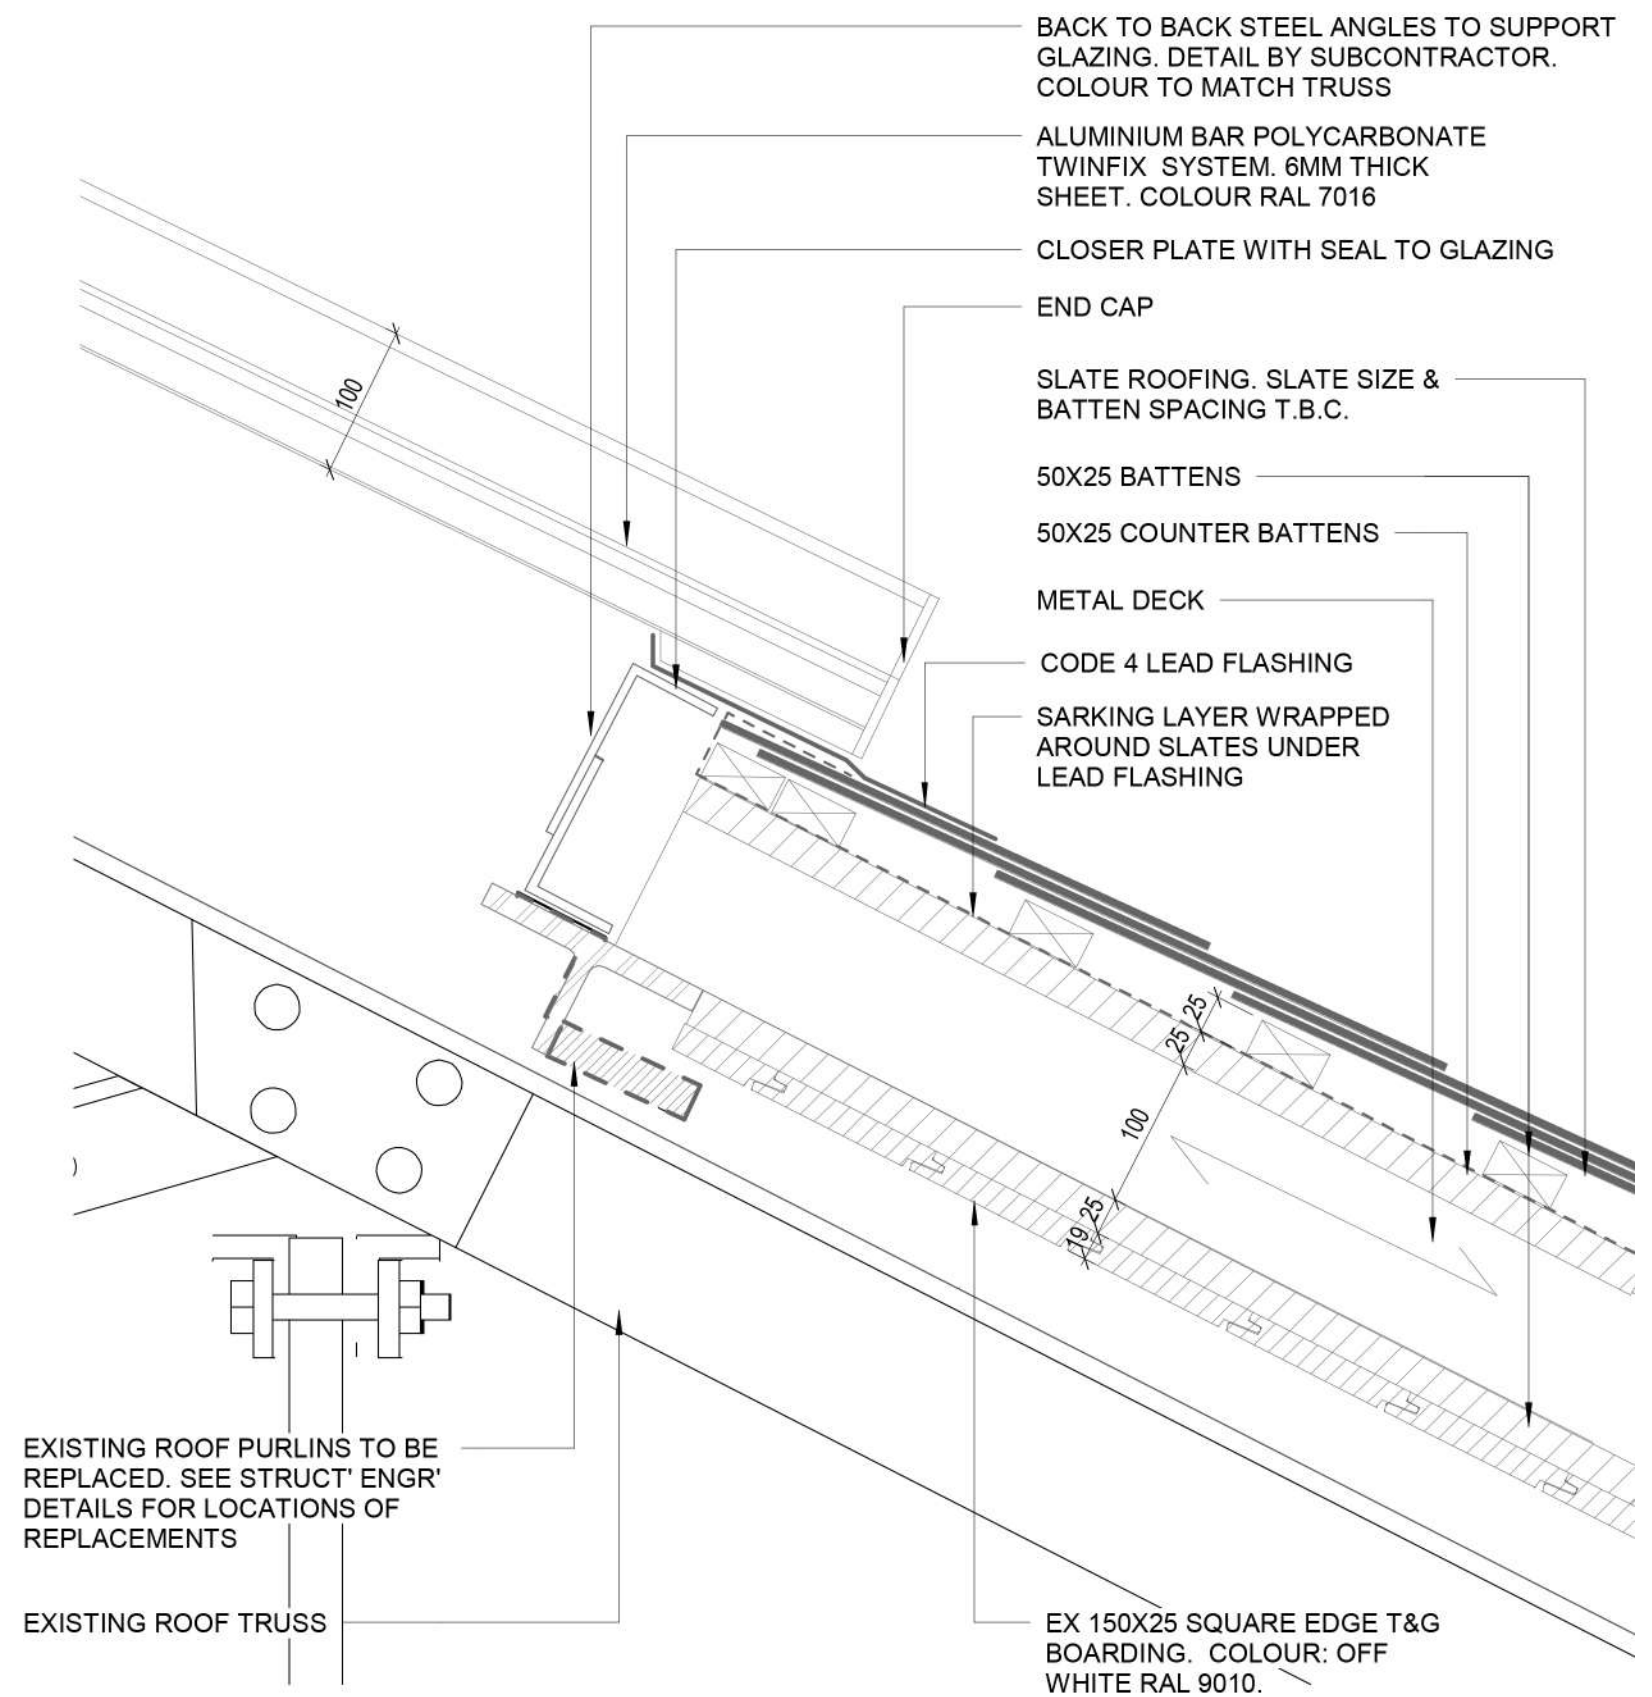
Section detail showing roof light and slate roof interface
